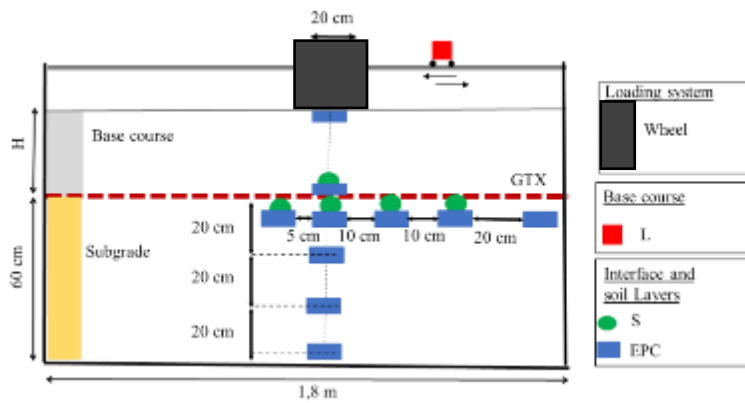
The instrumentation system used for the traffic load test zone, section B
